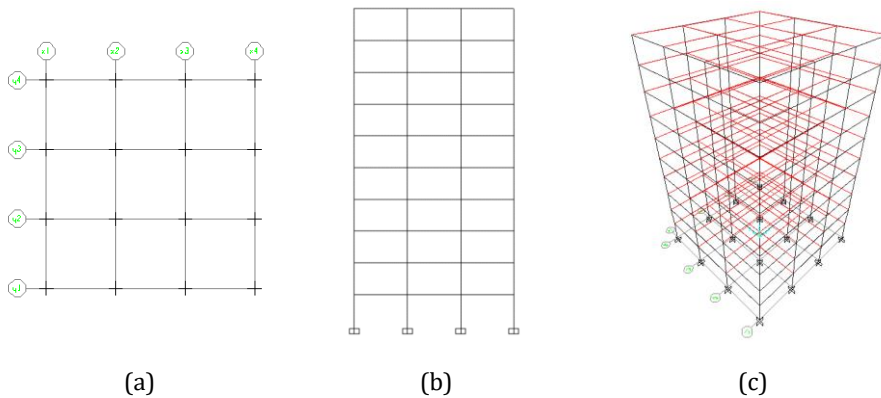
Building Model considered in this study using SAP2000 [42], a) plan view, b) side view and c) three dimensional view
